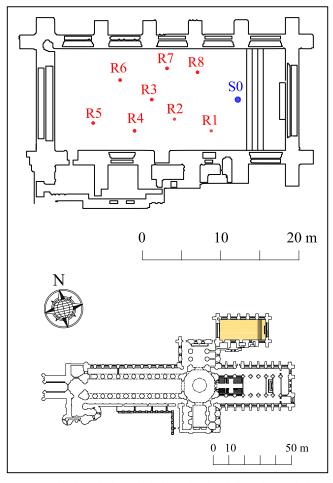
Sketches of Ely Cathedral's Lady Chapel floor plan, with the sound source (S) and receiver (R) locations set for the measurement session (upper row) and the Lady Chapel's location in the cathedral floor plan (highlighted in yellow).
